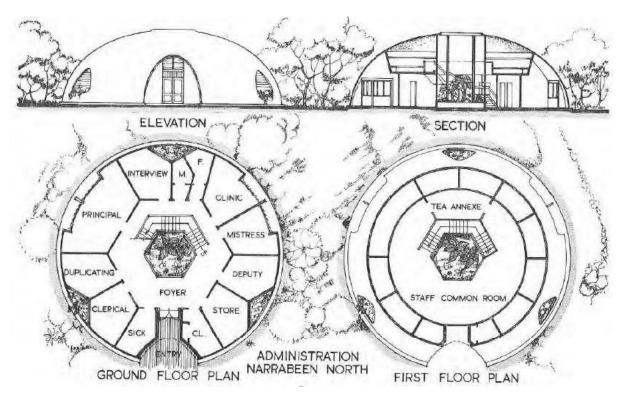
Plans, Section and Elevation for the Administration building, North Narrabeen Public School (Bini Shell A) (Source: Reproduced in construction of Binishell reinforced concrete domes, Department of Public Works, 1978, p. 9, cited in Betteridge, 2018, p. 22).
